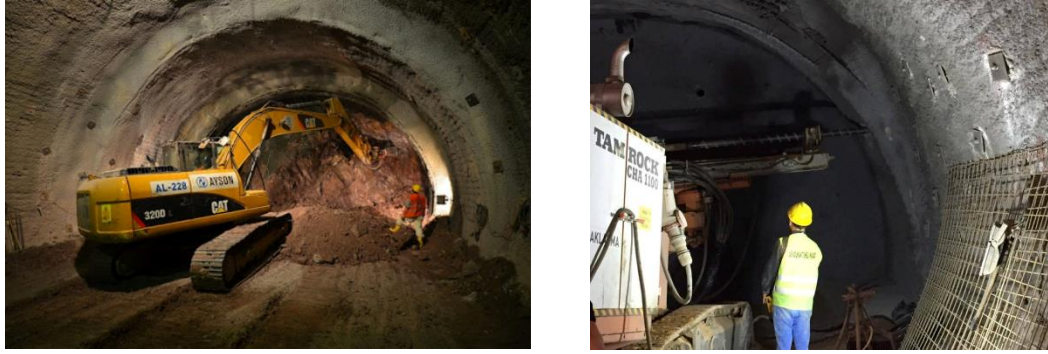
Top and bench excavation (a) and installation of the support system (b)
